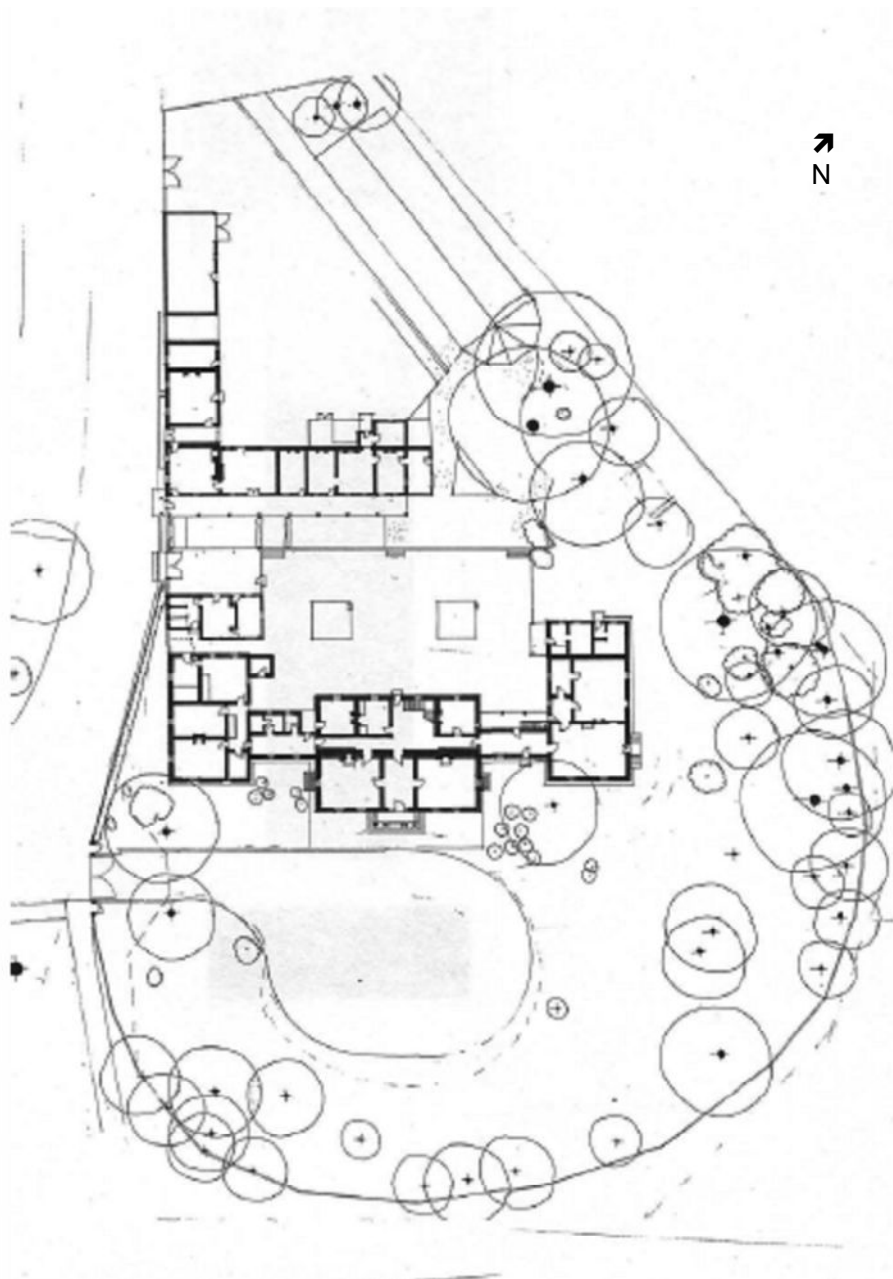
Site plan showing Old Government House and the immediate gardens being Lot 369 DP 752058 Parish of St John (source: The National Trust of Australia (NSW))
